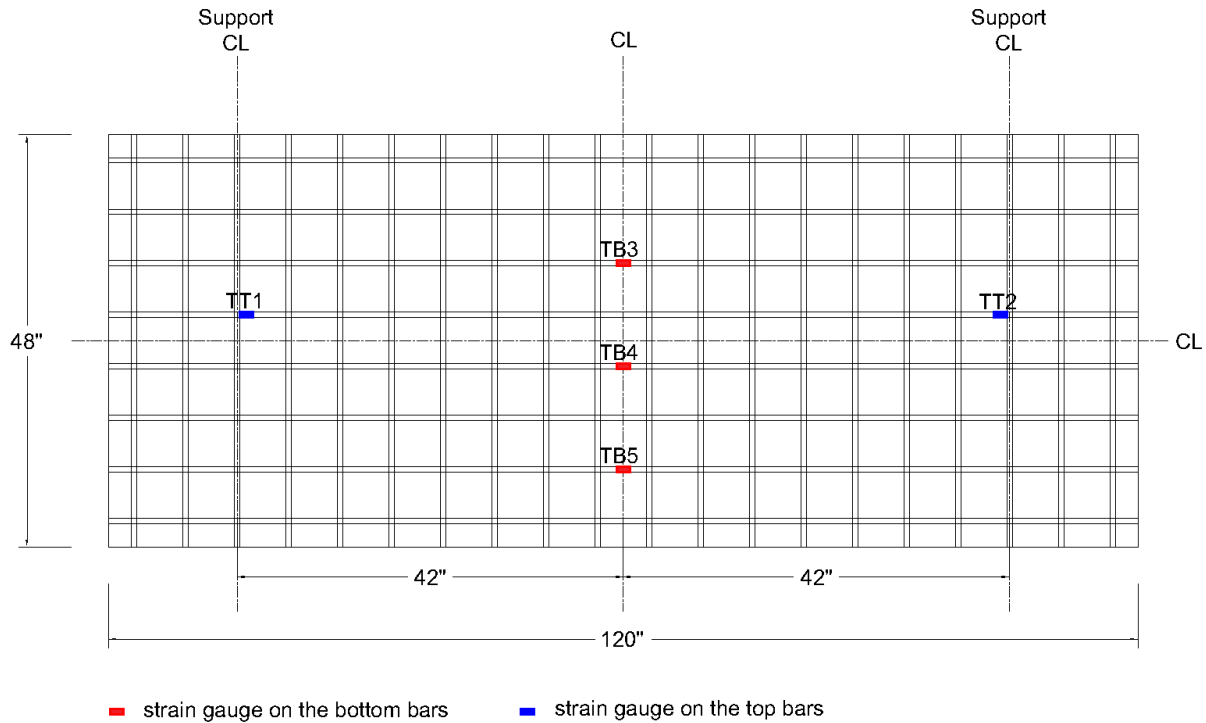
Location of strain gauges on reinforcement of bridge deck Prototype 3.
